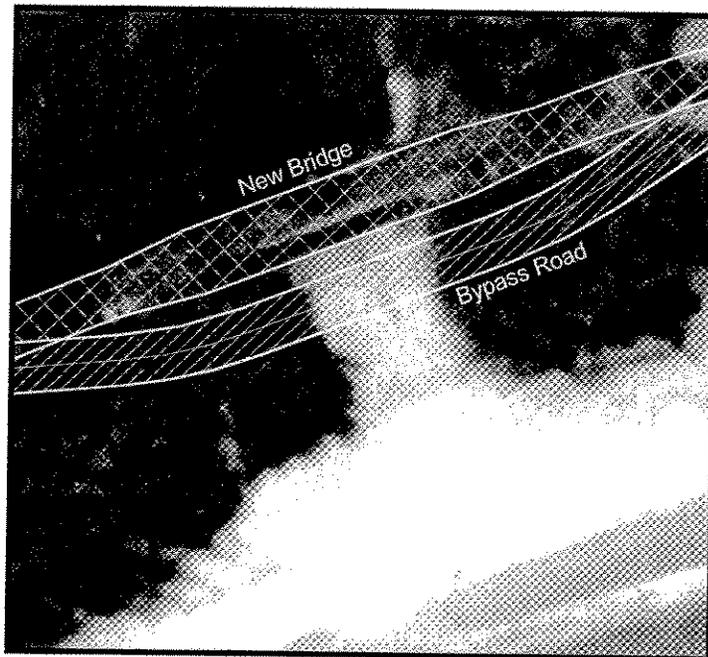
Approximate footprint of the new bridge and bypass road at the project site.
